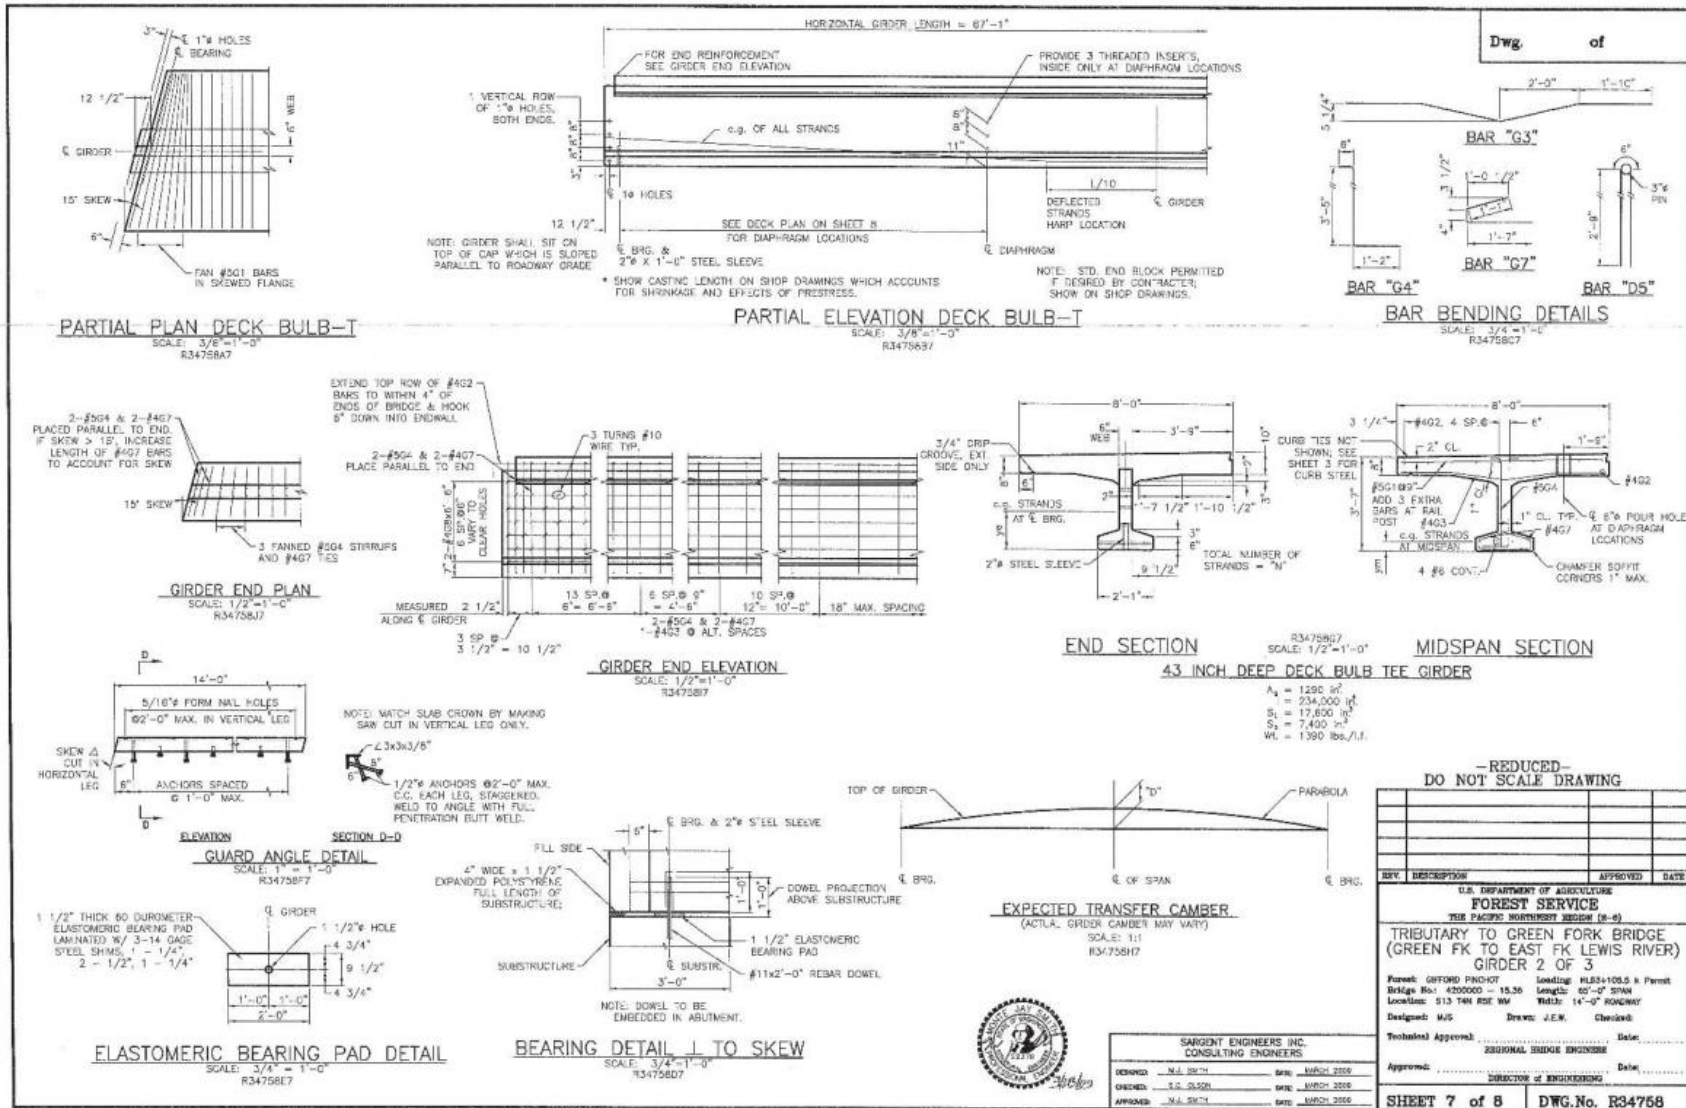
Bridge Deck Design Drawing for Gifford Pinchot National Forest, Girder 1 [8]
